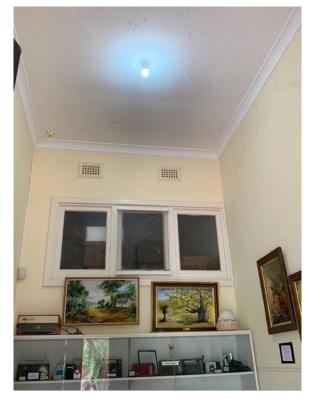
Windows in east wall of Lobby 2 looking into Figure 149: Panelled ceiling store room accessed from Hall 2
